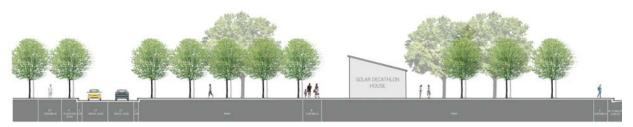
B Park Edge at Engineering Center Campus Section 1-1'
